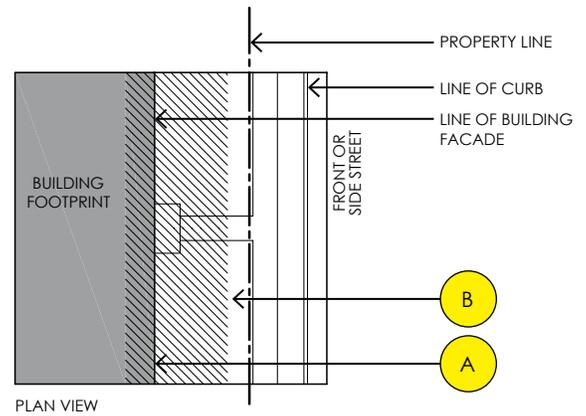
DETACHED HOUSE BUILDING WITH STOOP
